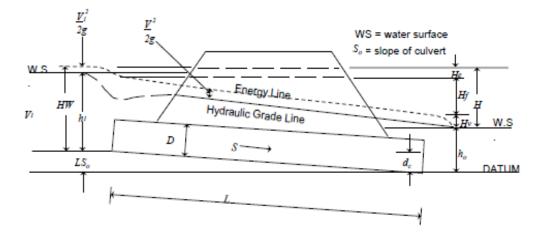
Hydraulics of Culvert Flowing Full under Outlet Control [Source: Road Drainage, 2010].
